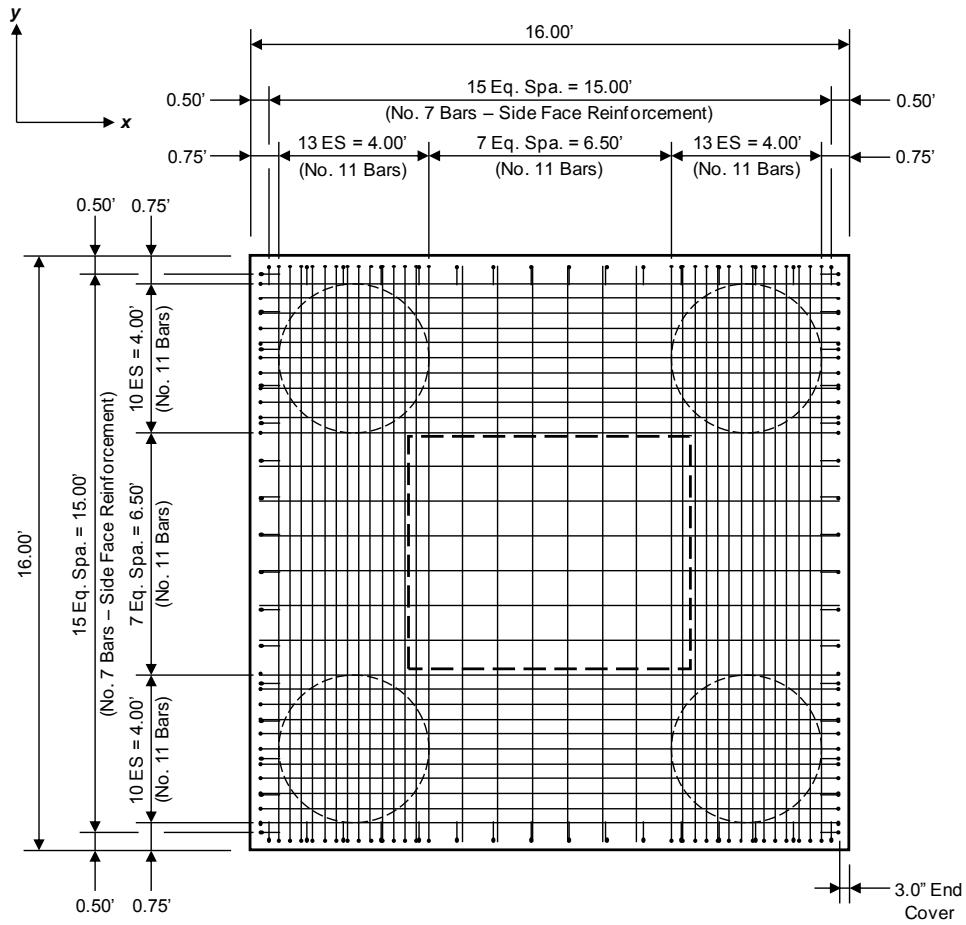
Reinforcement details – plan view (bottom mat reinforcement)
